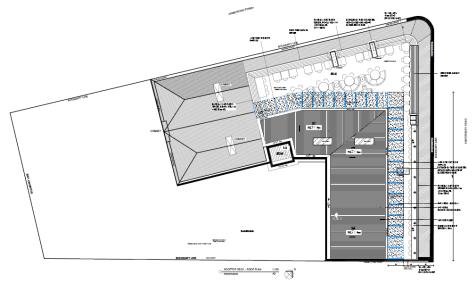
Proposed Roof Top Terrace – includes roof over.
